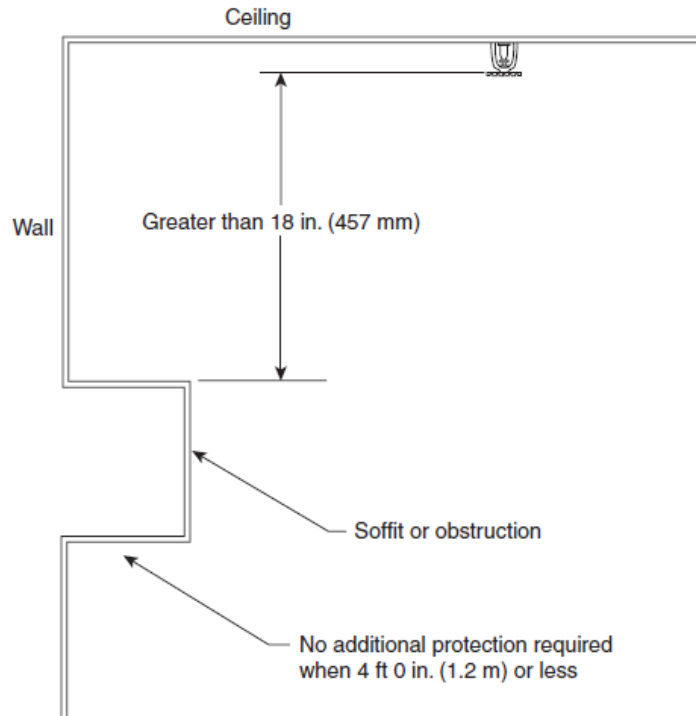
Soffit/Obstruction Against Wall Greater Than 18 in. (457 mm) Below Deflector.
